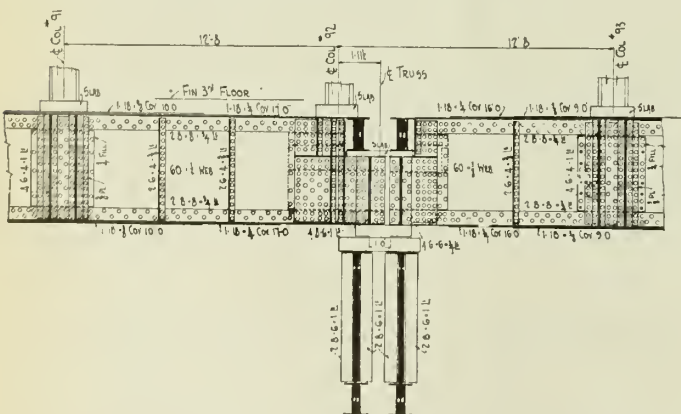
Detail of Support for Girder at Centre of Truss.
